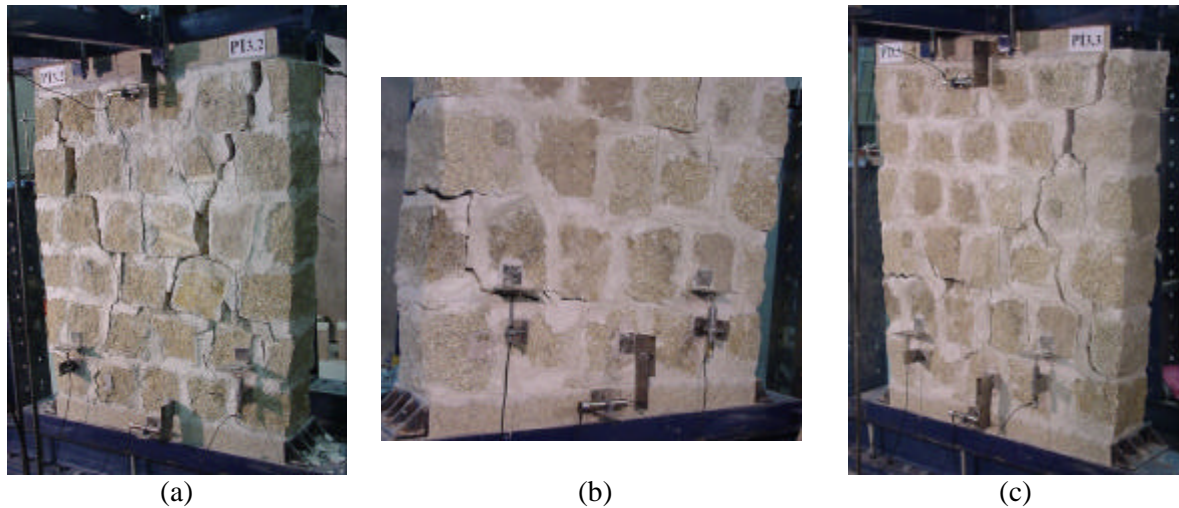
Failure mode and collapse of the walls WI.175; (a) collapse of the wall WI2.175; (b) flexural behavior of the wall WI3.175; (c) failure pattern of the wall WI3.175
